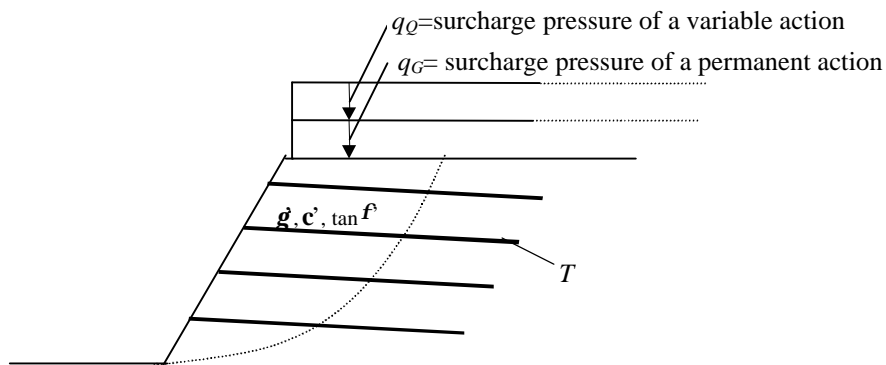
Reinforced slope/soil-nail reinforced slope
